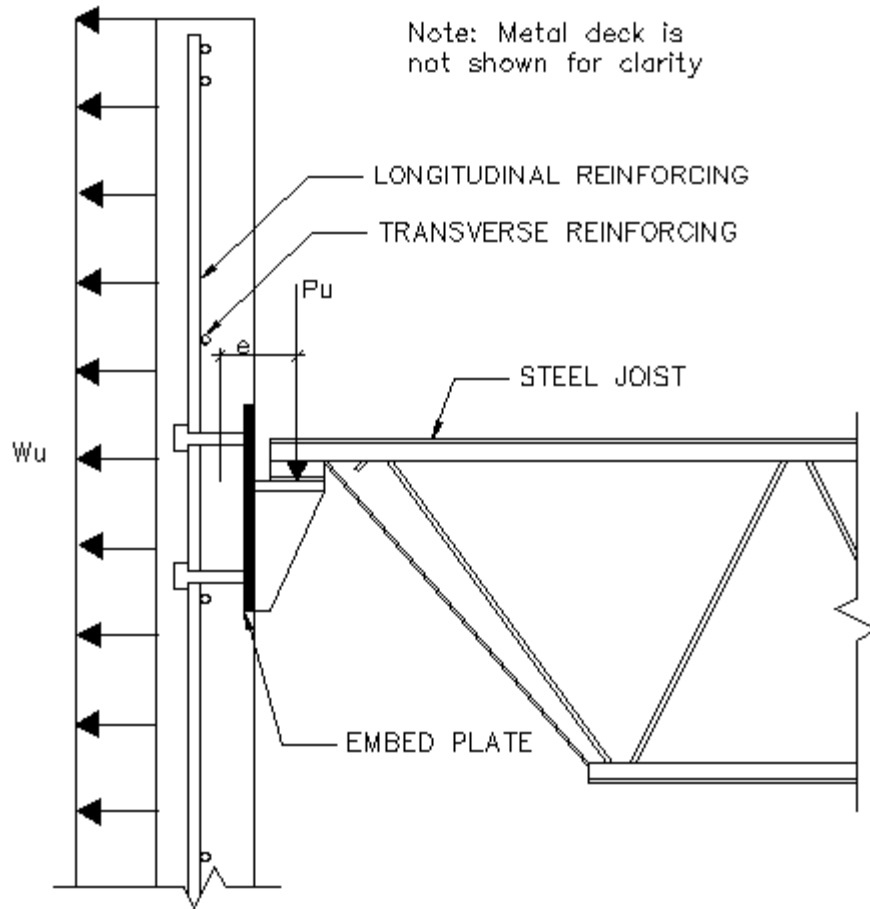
Typical Tilt-Up Panel Roof Connection
